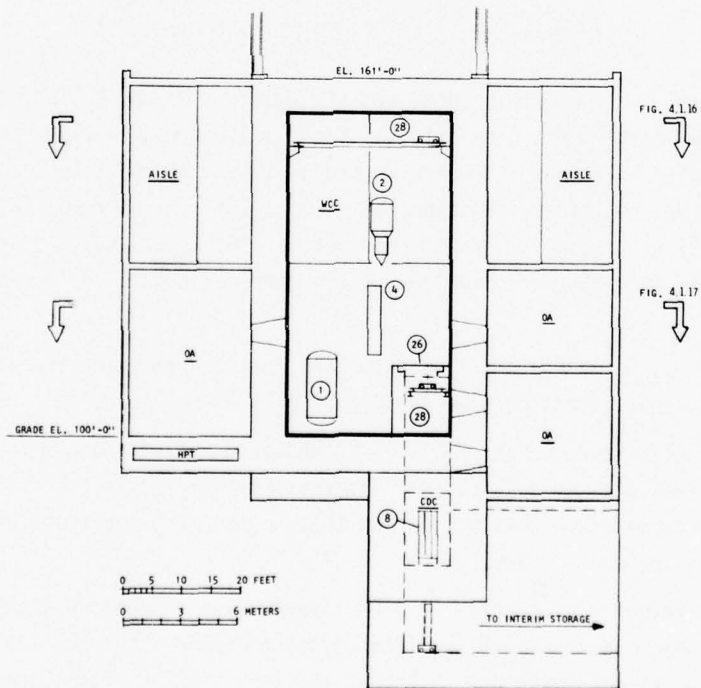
Waste Calcination Process Equipment Arrangement, Section C-C
